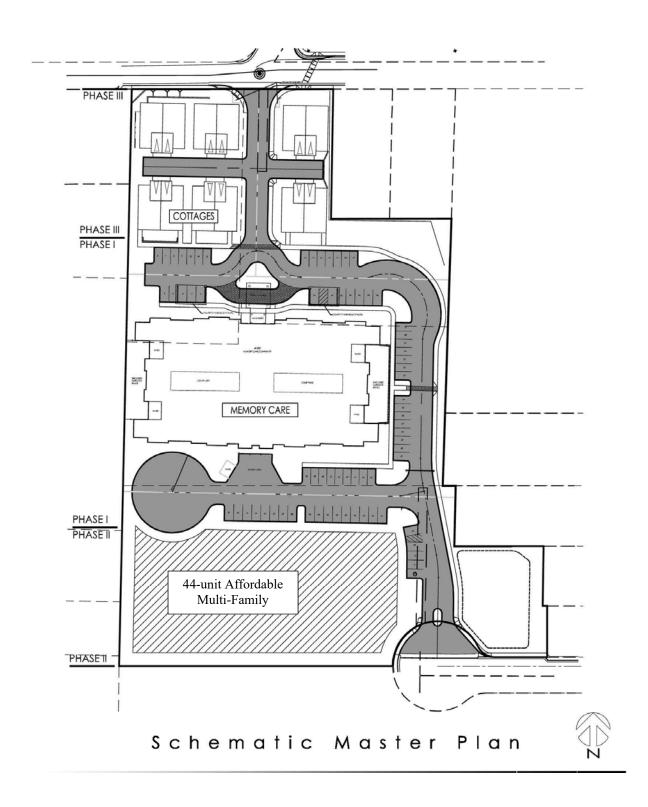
SIERRA SENIOR CARE SITE PLAN
